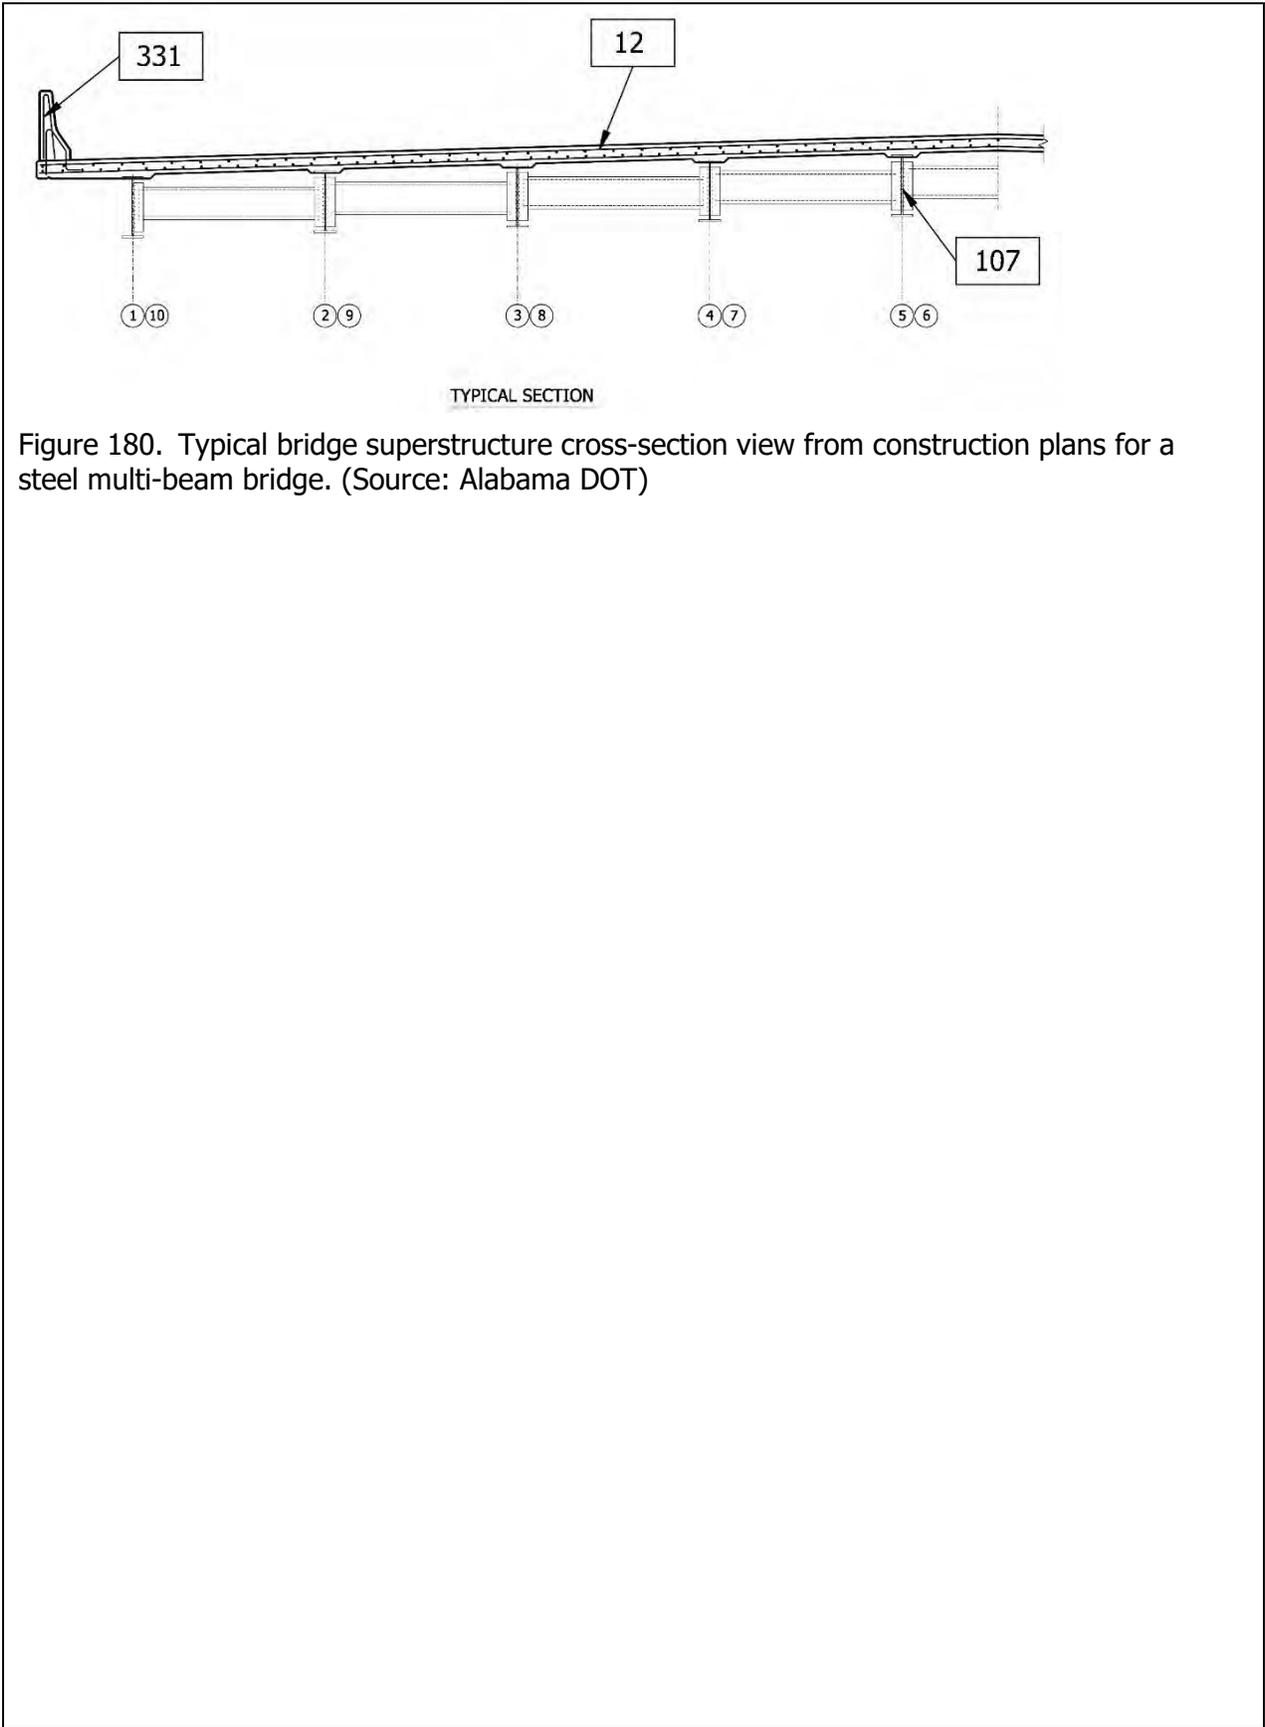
Typical bridge superstructure cross-section view from construction plans for a steel multi-beam bridge. (Source: Alabama DOT)
